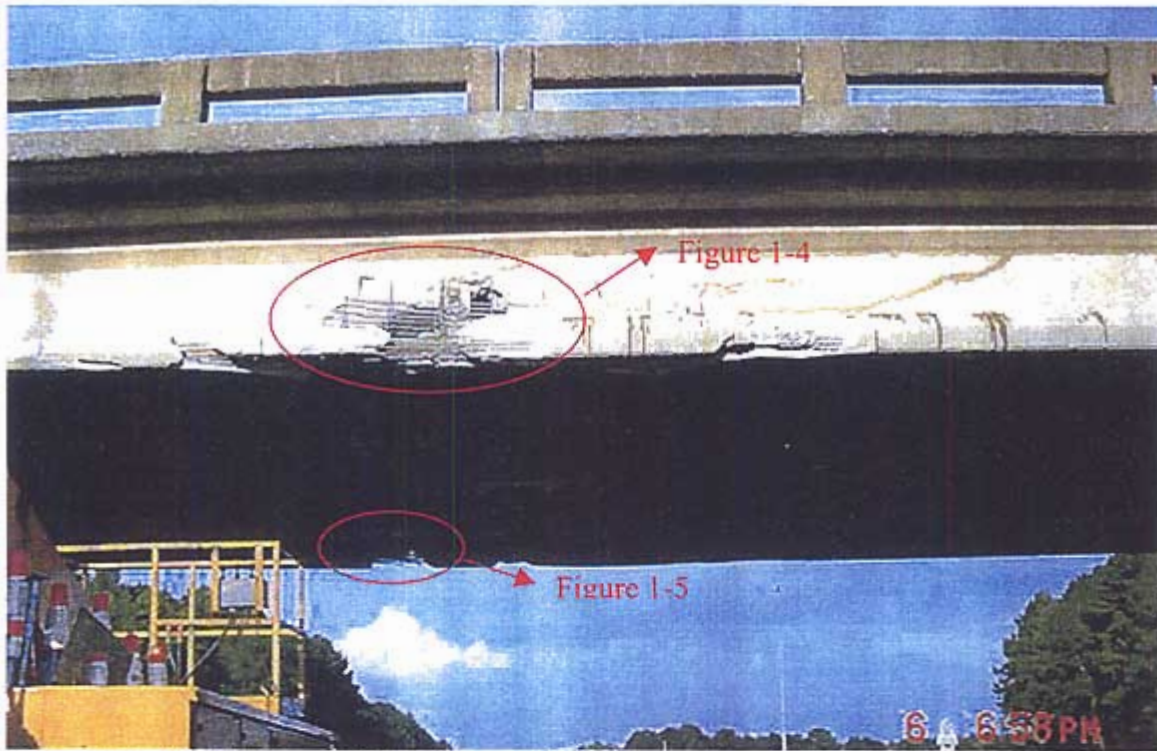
Chaffee Road Bridge Overall Damage Looking East, Westbound Traffic
